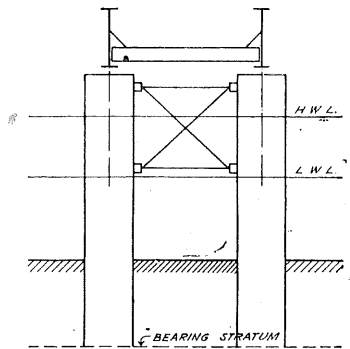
TYPICAL ARRANGEMENT OF CYLINDERS FOR BRIDGE PIERS.
